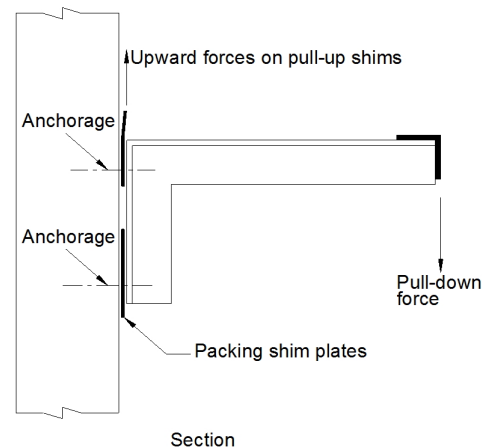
Anchorage(wash basin) eccentric downward loading test
